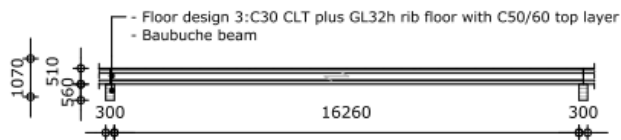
Cross-section C-C BauBuche beam in mm minimum height
